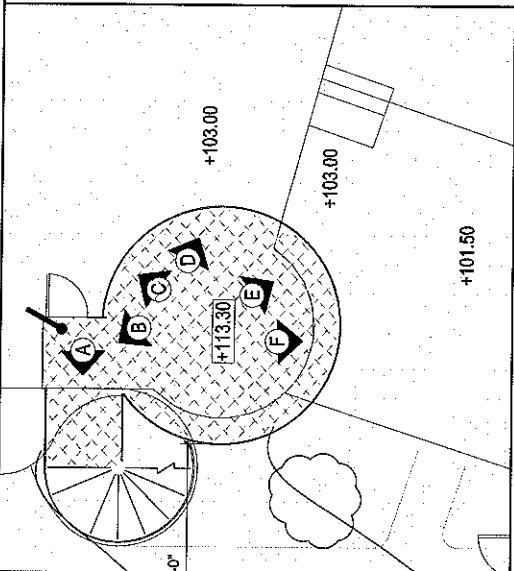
PHOTO REFERENCE PLAN (Refer to Sht. A0.7)
